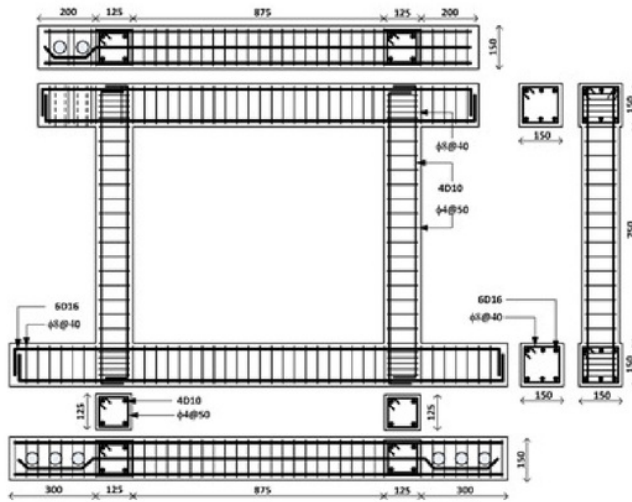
Geometry and reinforcement detail of the R/C frame specimen
